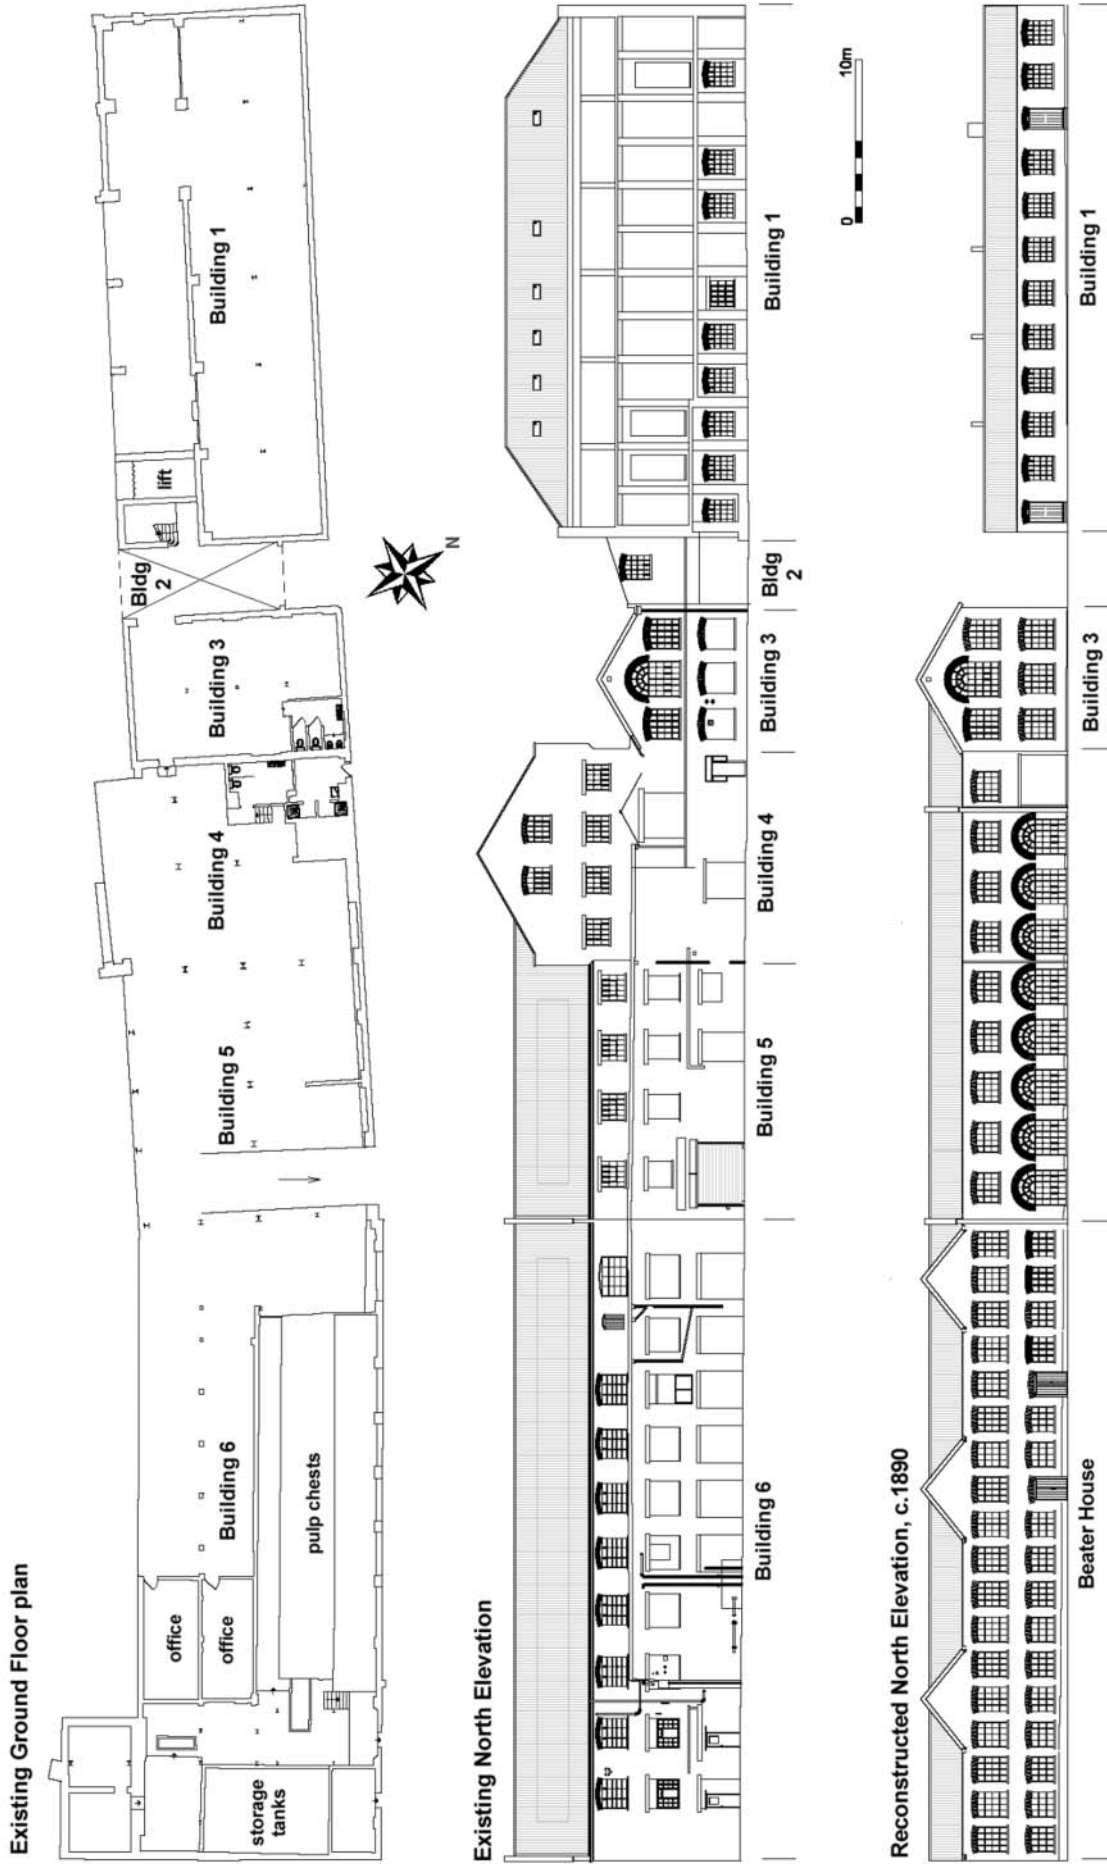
The millhead range (Buildings 1–6), plan and elevations (2008), and reconstruction of elevation, c. 1890.
